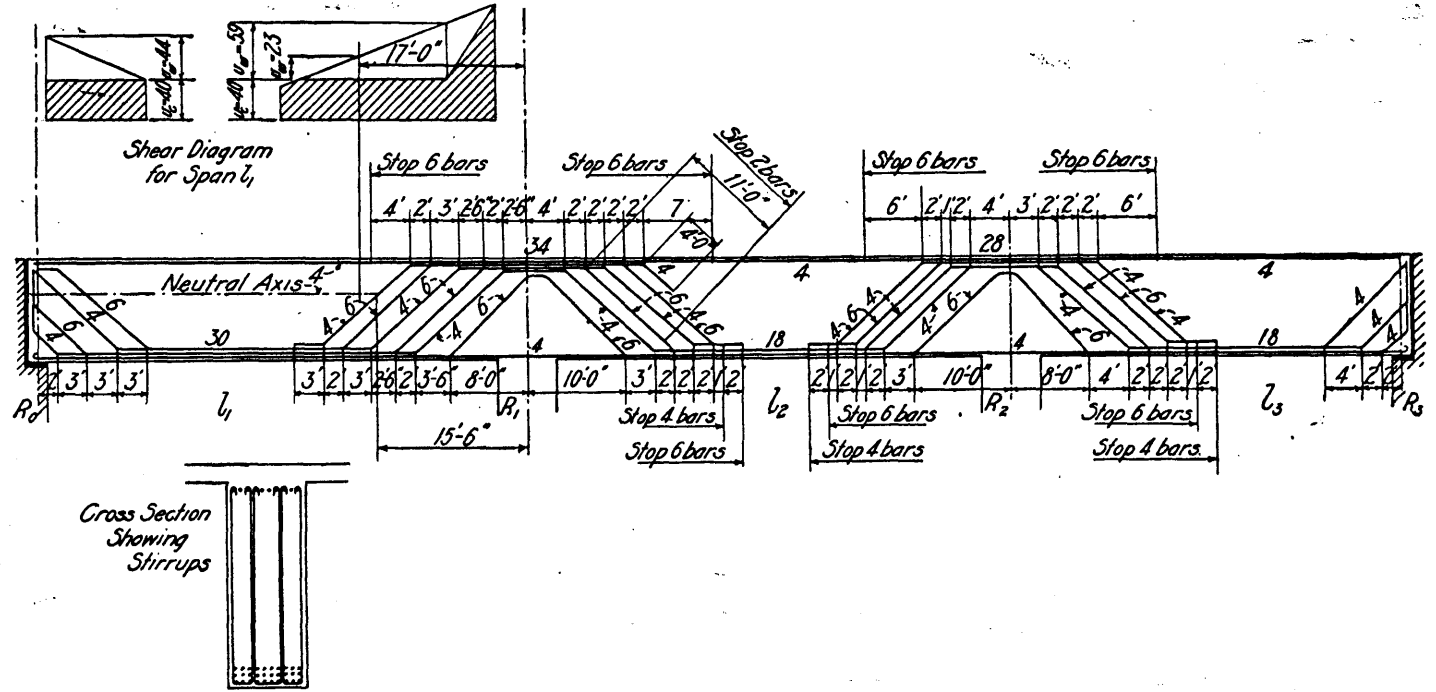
Shear Diagram and Details of Reinforcement for a Three-Span Continuous Girder.
